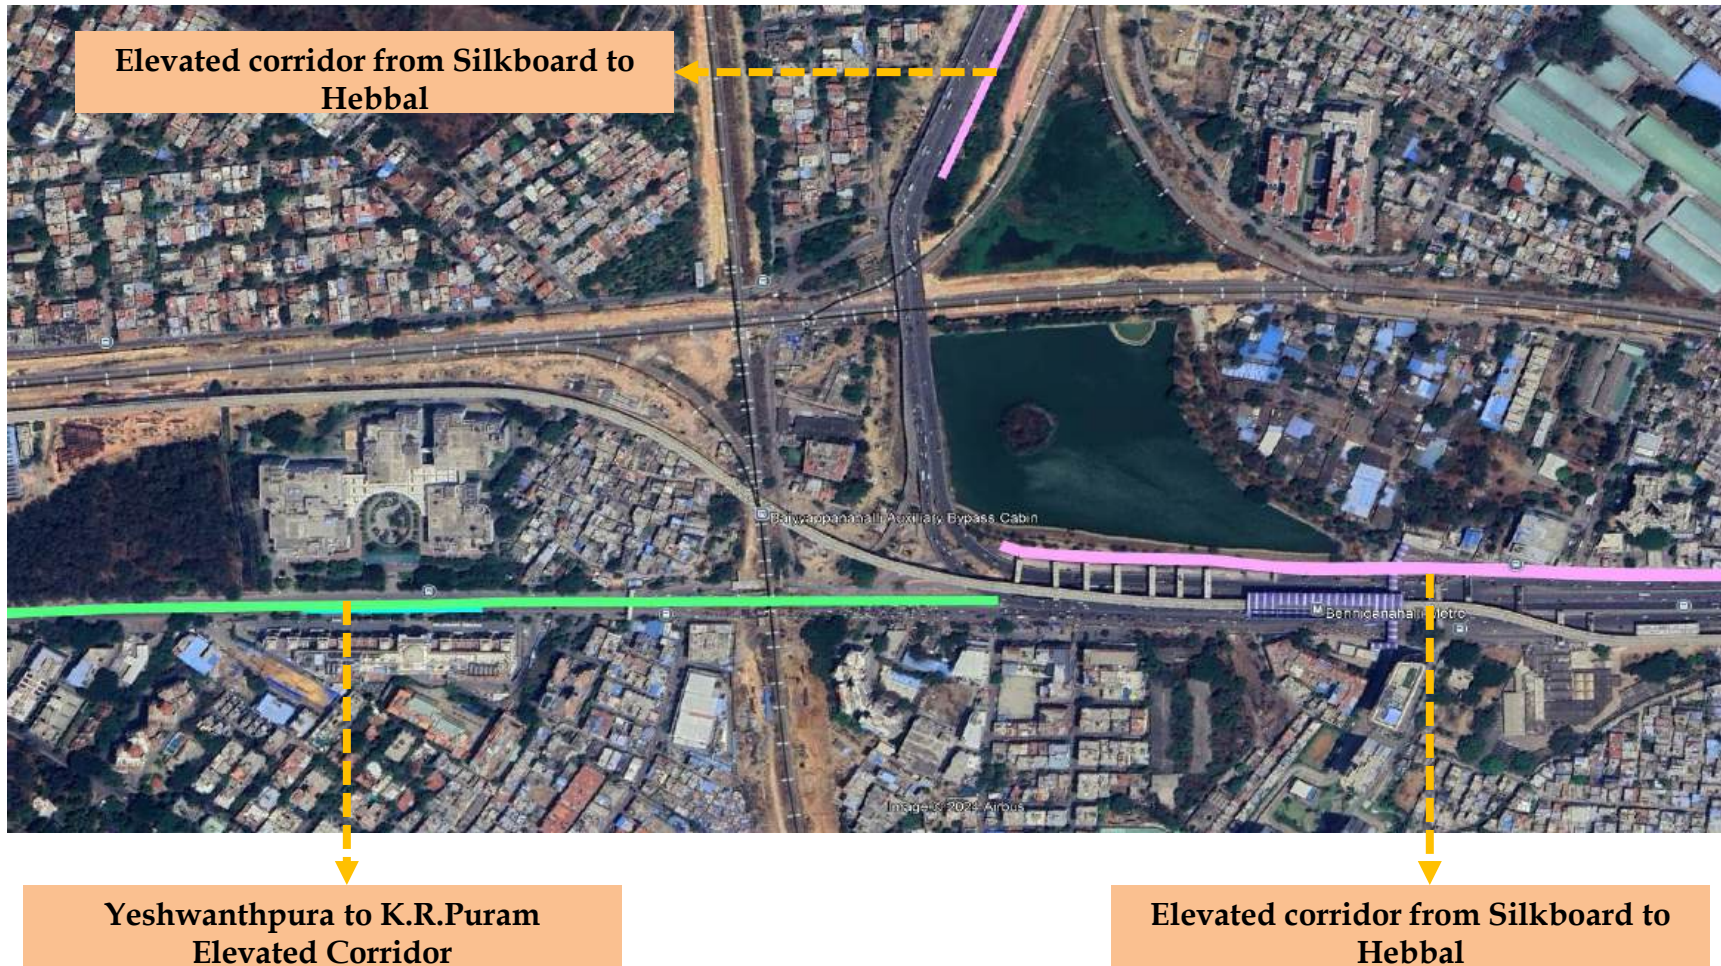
Site Proposed Elevated Rotary & Loop System at K.R.Puram Interchange
